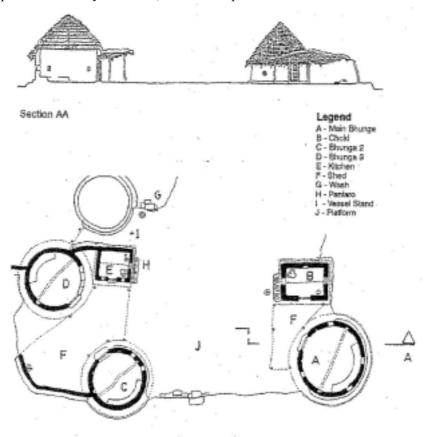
Typical traditional house plans – village Modpar Source: Vastushilpa foundation and Mc. Gill University, 2001
